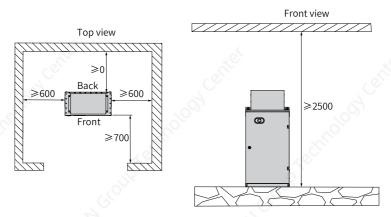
Mounting clearance requirements of the MR control cabinet (Unit: mm)
